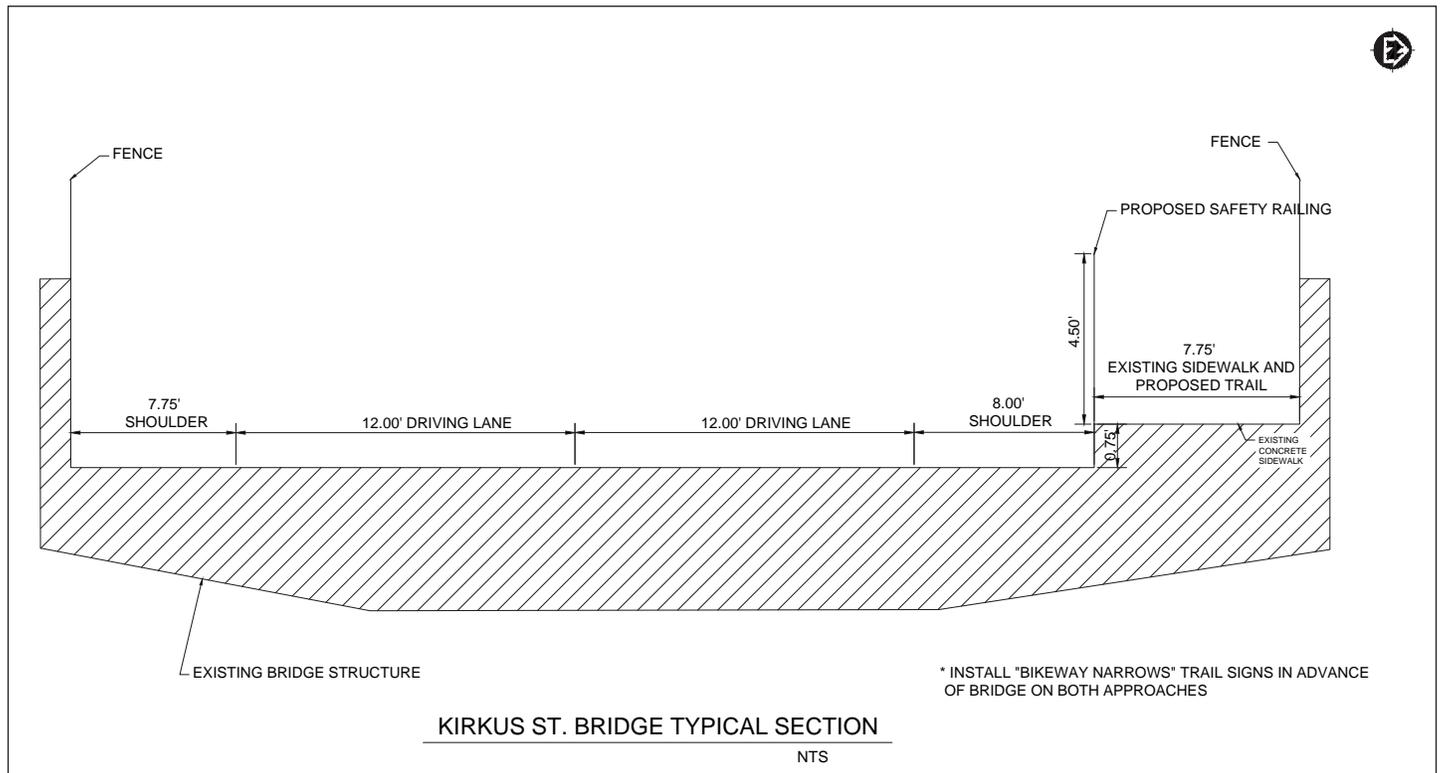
GENERAL ENGINEERING SPECIFICATIONS – KIRKUS STREET BRIDGE
